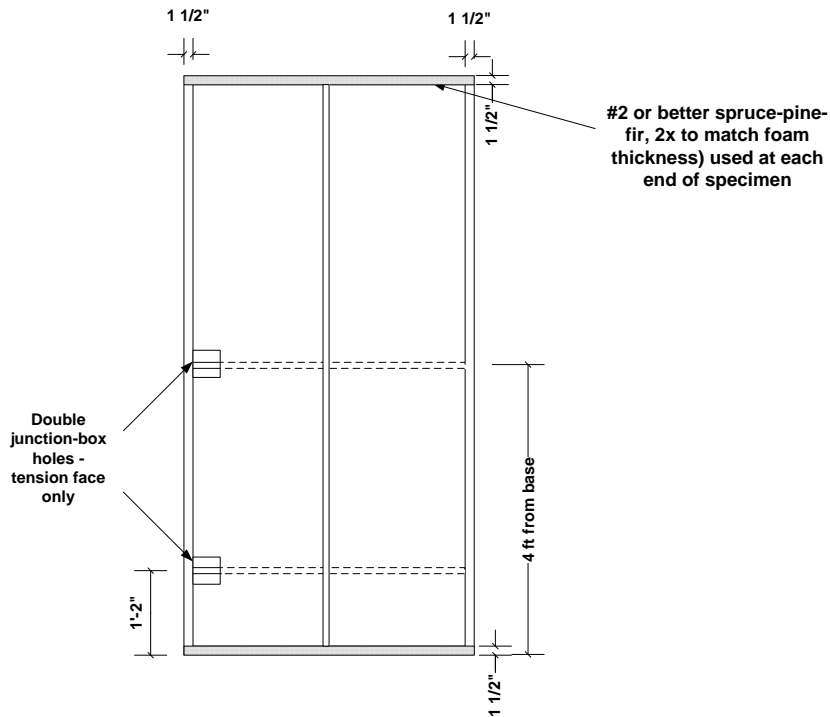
Specimen configuration for transverse load tests (1 inch = 25.4 mm)
